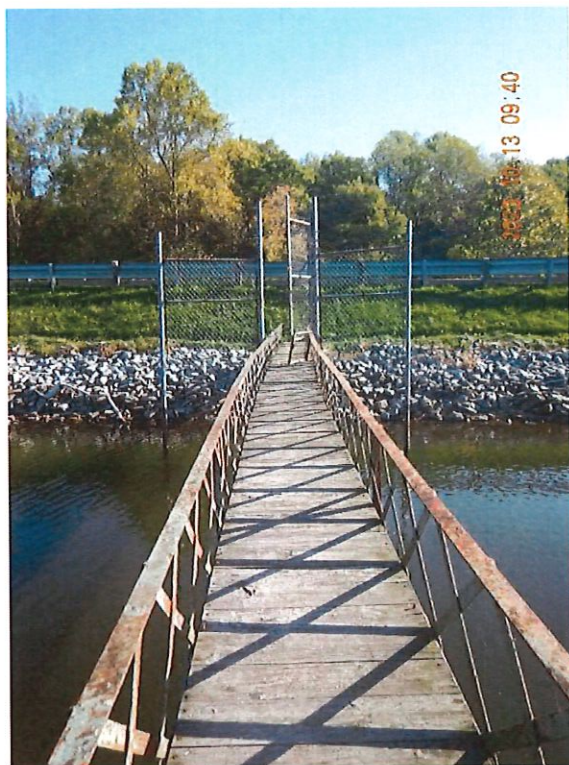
description: Locked Gate at Access Walkway to Intake Tower
